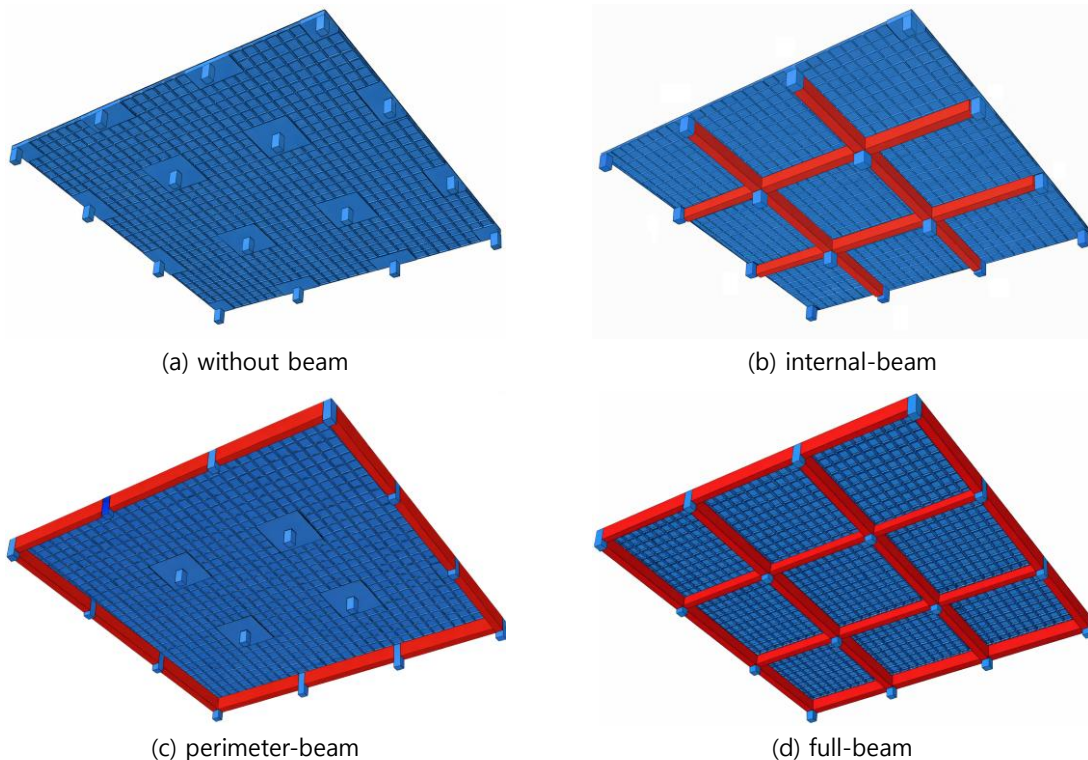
Three-dimensional views of the four beam configurations considered at Level 2 within two-way joist slab systems: (a) without beam, (b) internal-beam, (c) perimeter-beam, (d) full-beam.
